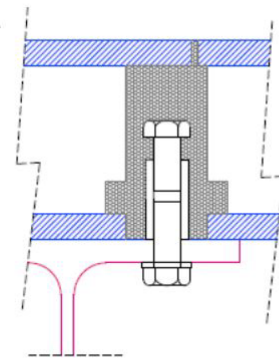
An iSRR connector connecting a steel girder with an FRP deck (Csillag, 2018).
